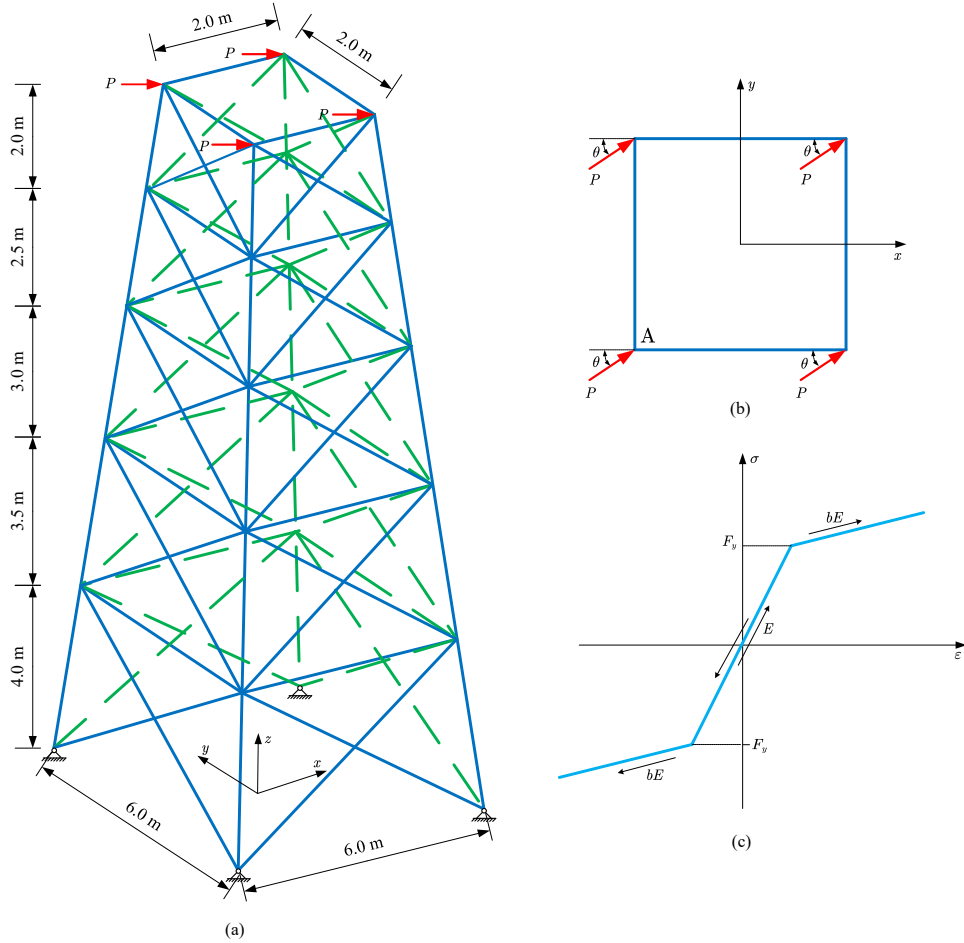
A transmission tower subject to wind loads: (a) 3D truss model; (b) loading at the top of tower; (c) bi-linear constitutive model.
